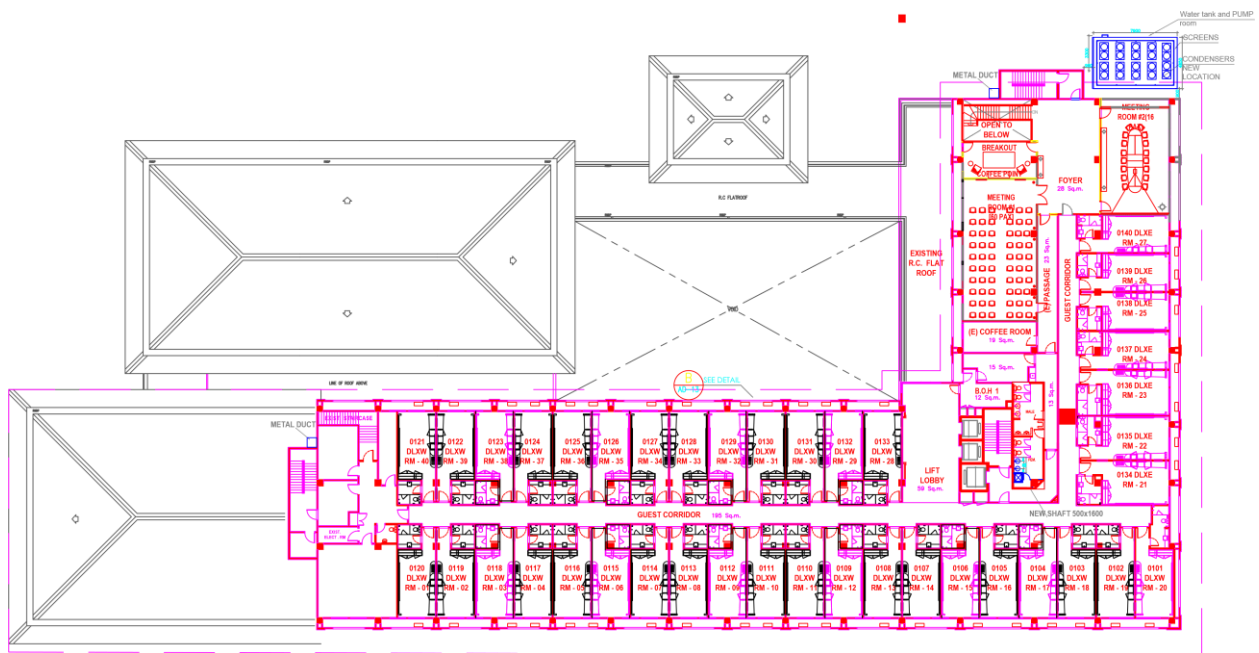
Floor plan of level 1 (Clear figure in Appendix-3)
